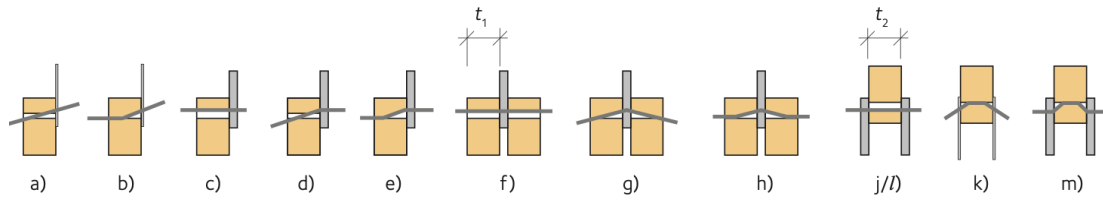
Failure modes for timber-steel connection (Swedish wood, 2022b)
